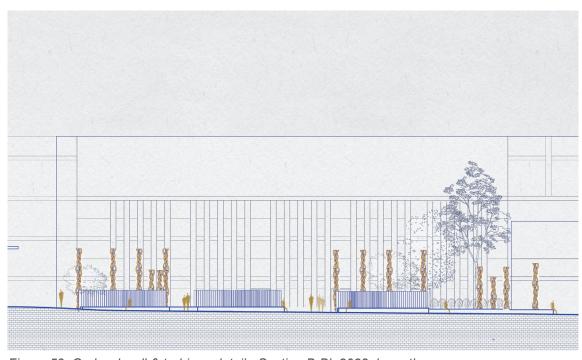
Orchard wall & turbines detail - Section B-B'. 2022, by author. (not to scale on a 8.5x11 sheet)
